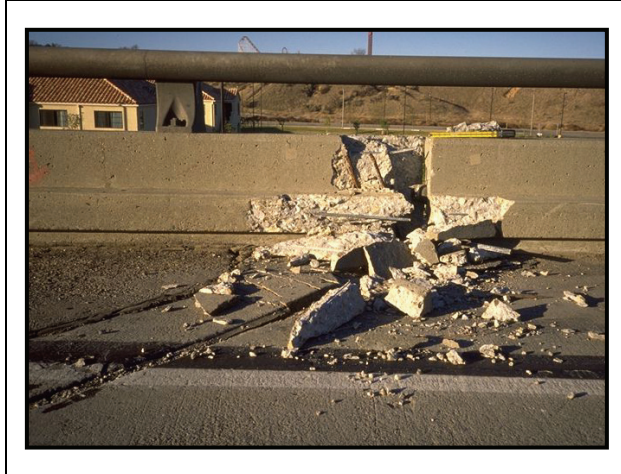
Minor Damage: Parapet Crushing / Spalling (NISEE)
